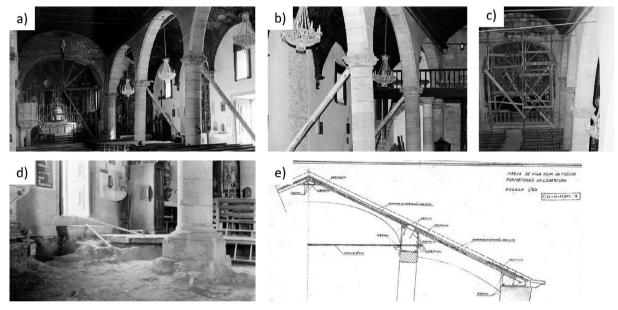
Main interventions carried out on Foz Côa Church in the 1970s: (a) bracing of the Main Arch and columns, (b) details of the columns bracing and (c) details of the main arch bracing; (d) inspection performed on foundations elements and (e) detail of project of the reinforced concrete roof slab built during the retrofitting measure [17].
